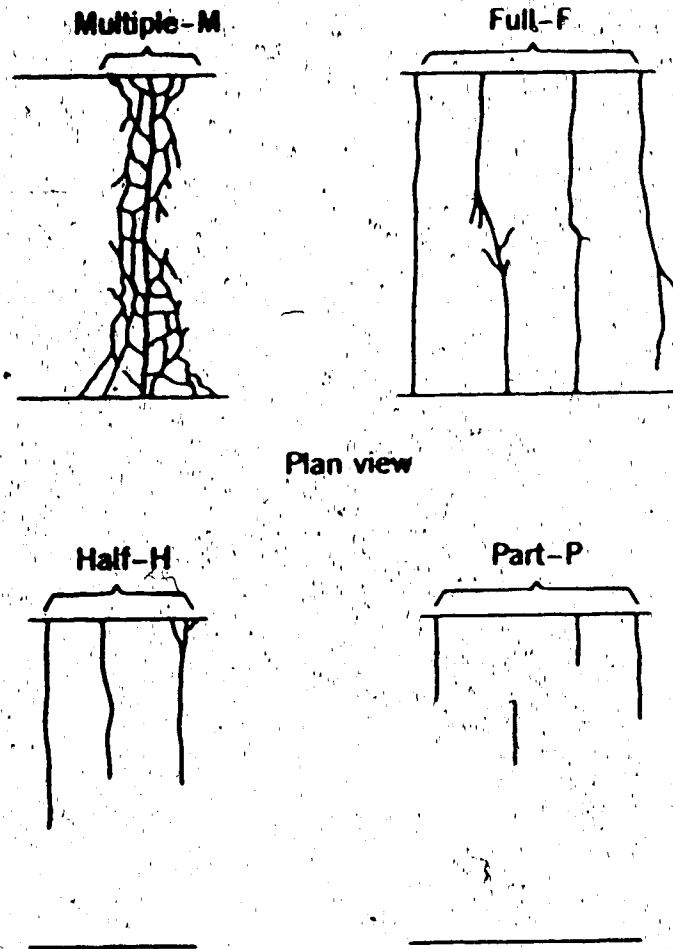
DIFFERENT TYPES OF PAVEMENT TRANSVERSE CRACKS.
